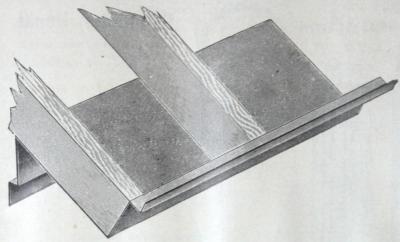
Shows section of Sheet Steel Cornice, as applied on rafters.
